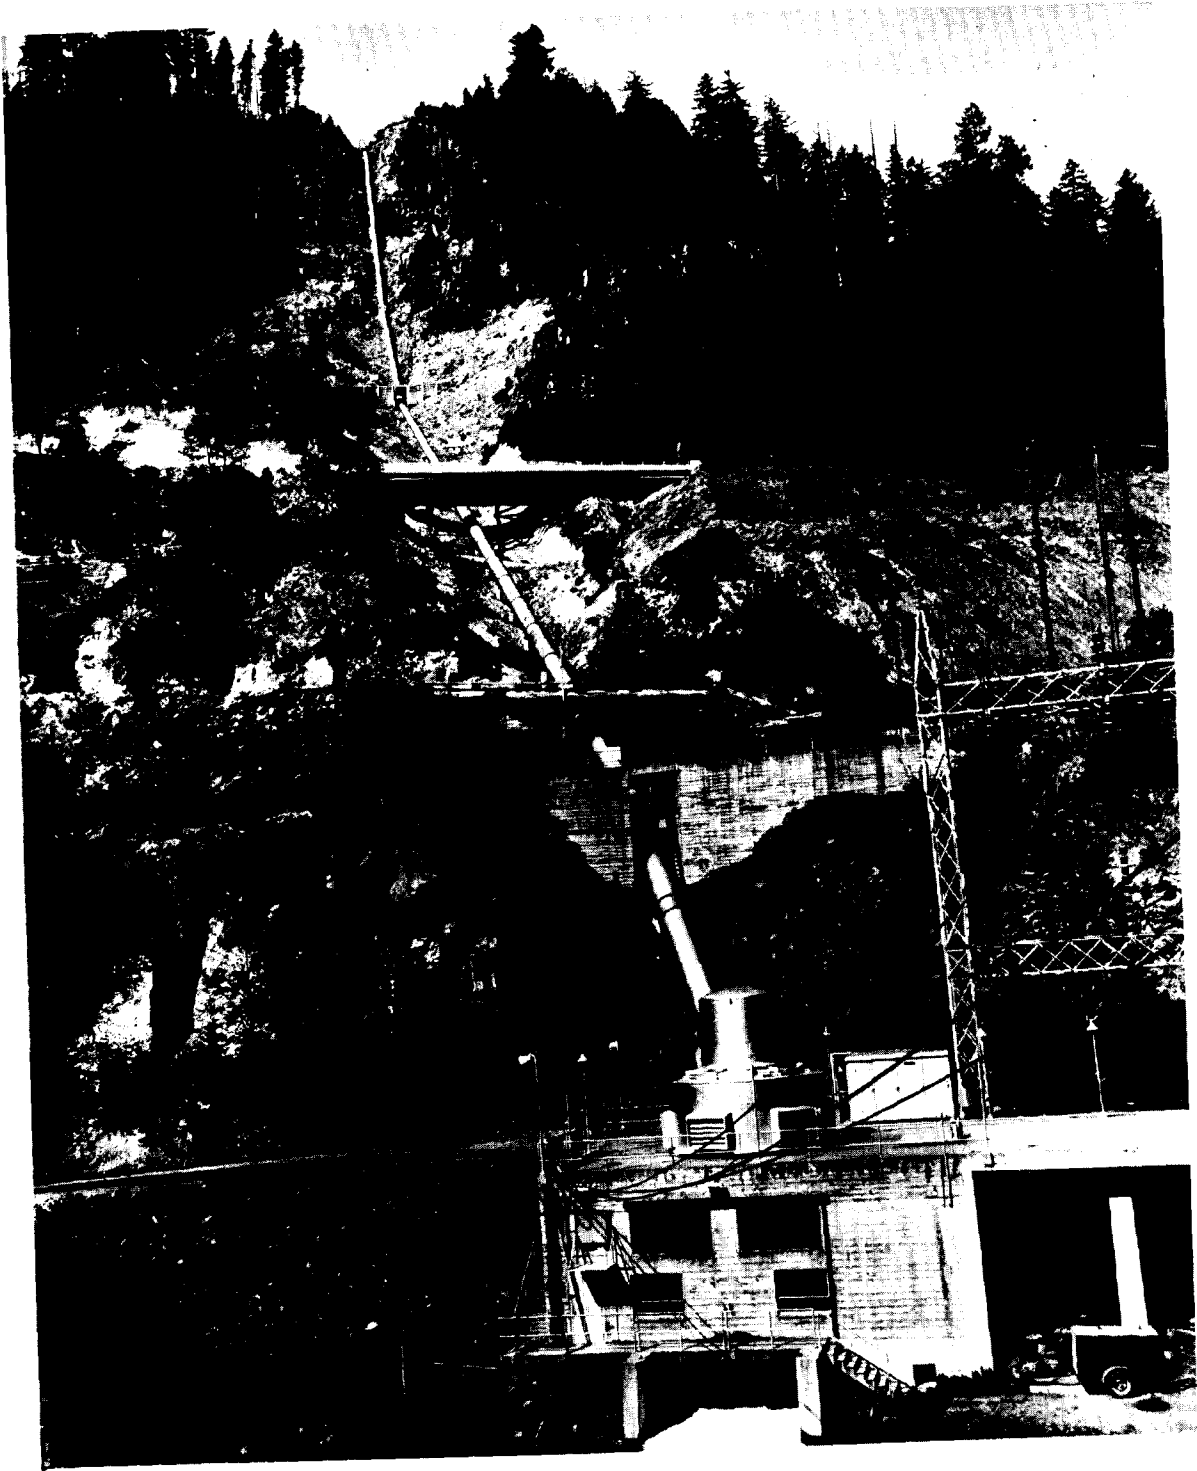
Penstock and outdoor powerhouse, Fish Creek Project (Courtesy of Pacific Power and Light Company)
